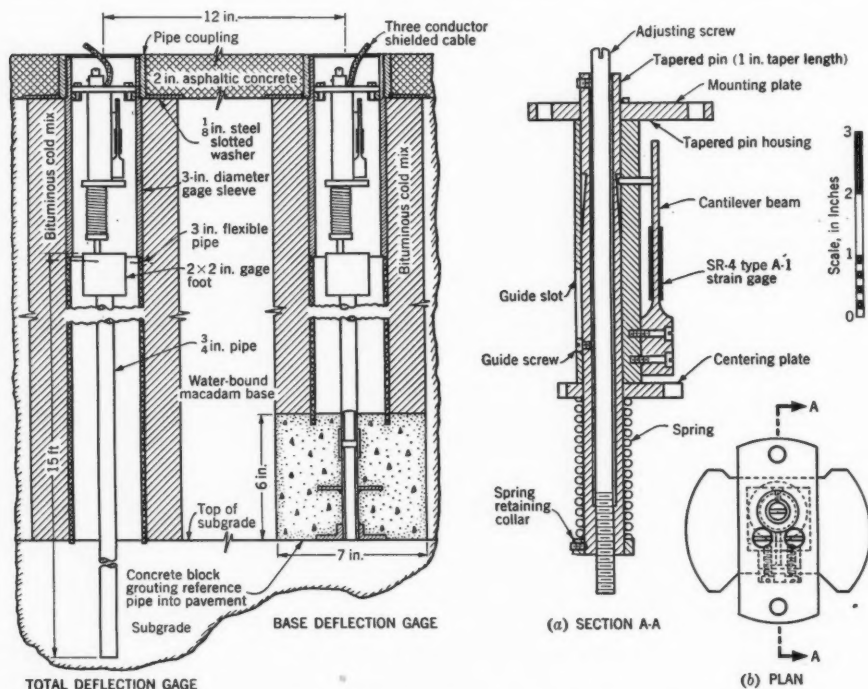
TYPICAL DEFLECTION GAGE INSTALLATION      FIG. 25.—DETAILS OF DEFLECTION GAGE
